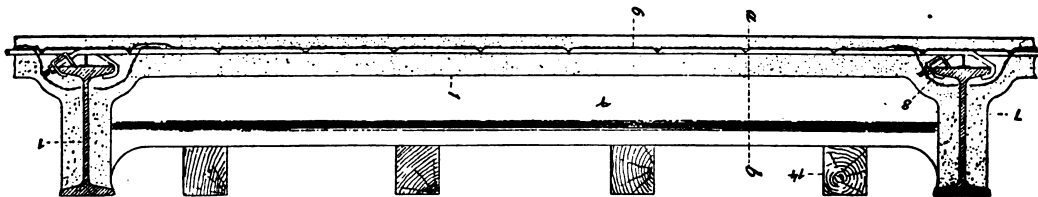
Similar to Fig. 1, but adapted to carry Floor and Ceiling Load.
